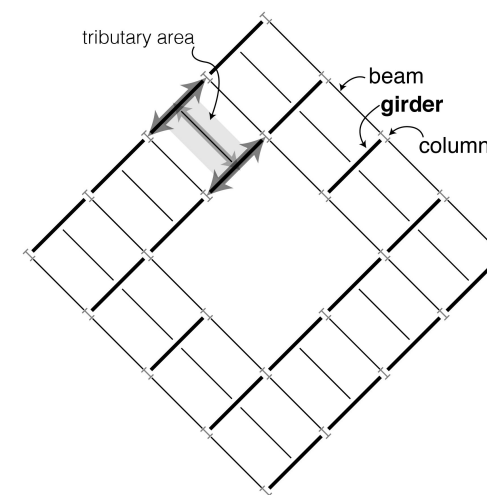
Typical gravity load path at the plan level, illustrated here on typical Tower Unit 0 and 1 plan.
